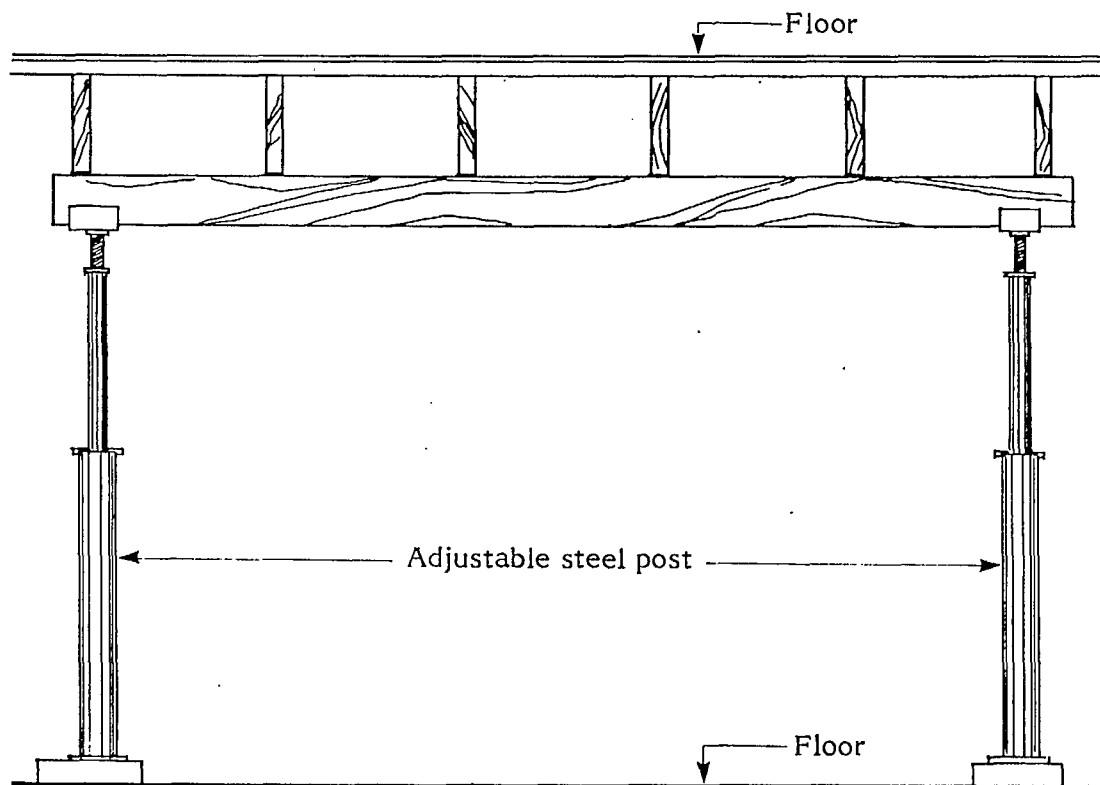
DETAIL OF JOIST SUPPORT
